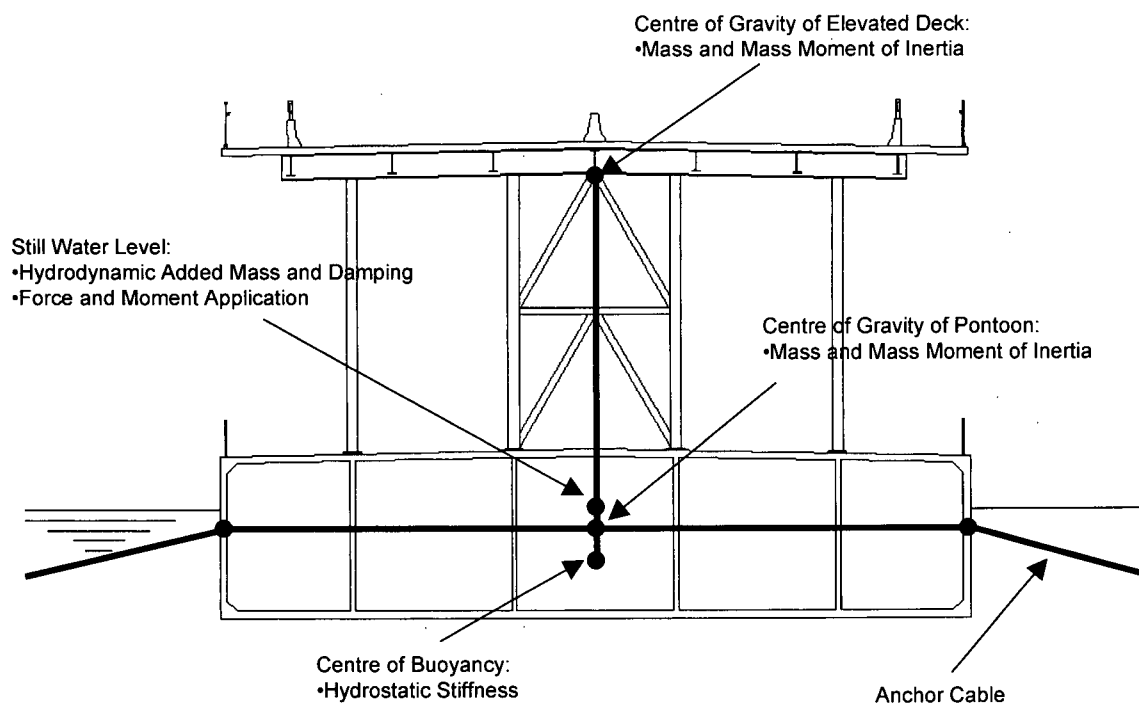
Cross-sectional view of the COSMOS/M finite element model of the bridge showing mass, spring and damper locations.
